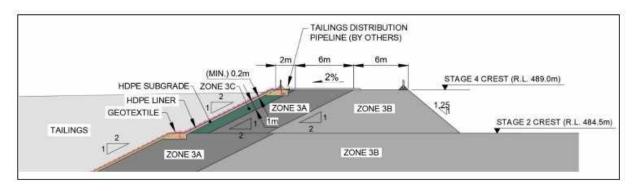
Typical Section IWLTSF Stage 4 North Embankment (REC, 2025)
